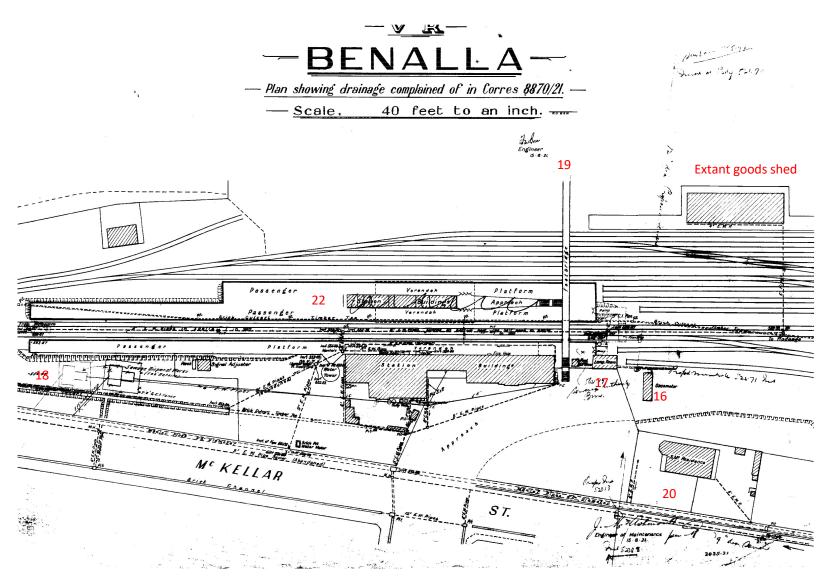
Benalla. Plan showing drainage complained of in Corres 8870/21, 1921.
